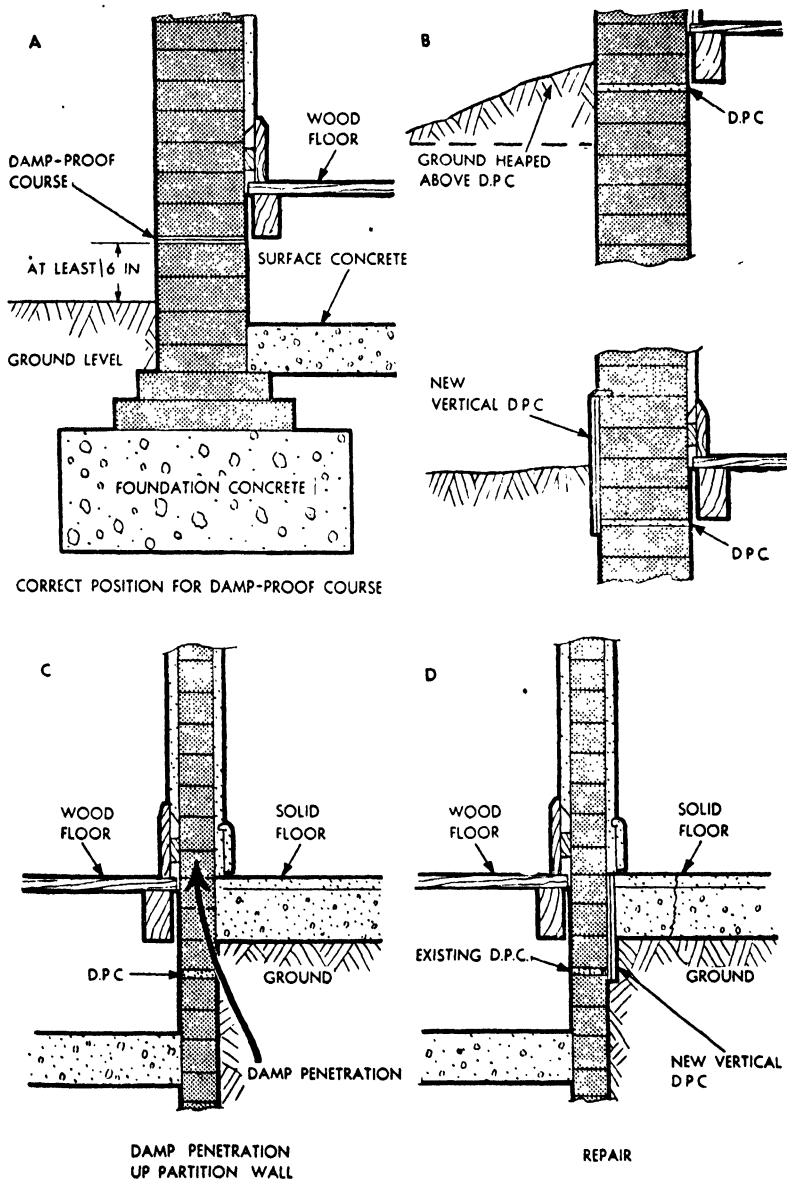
Various positions for dampproof courses. A. D.p.c. between ground and ground floors and 6 in. above ground level. B. Vertical d.p.c. C. A common defect; the d.p.c. is several inches below the concrete, thus allowing damp to pass through the unprotected gap. D. Method of repairing defect shown in C. This is done by cutting out the concrete floor and placing the new d.p.c. in the position shown.
